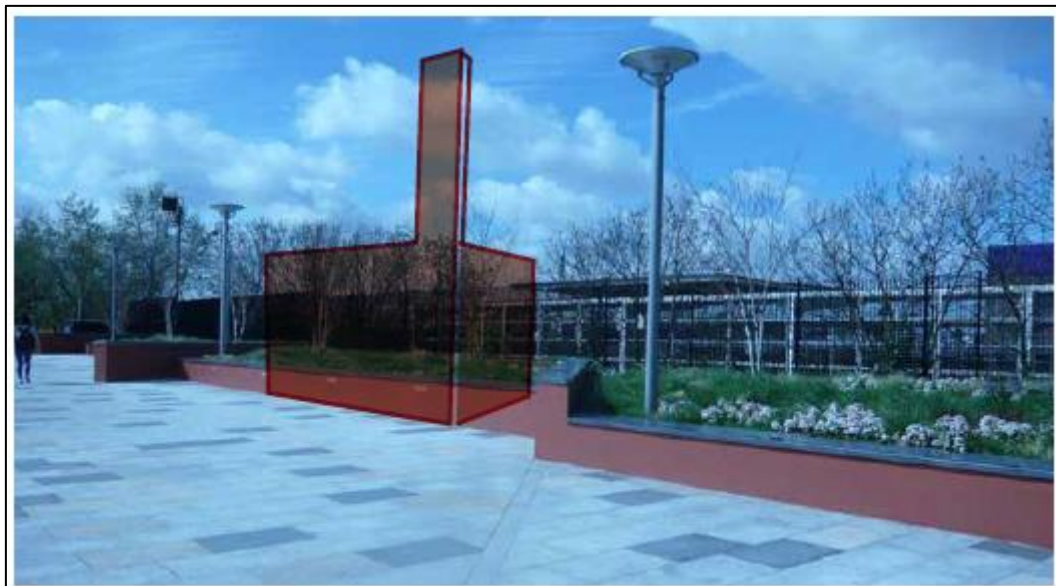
Public realm area on Hale Village illustrating the proposed location of the link gateway. (Source: Design and Access Statement submitted with application HGY/2013/2610)
